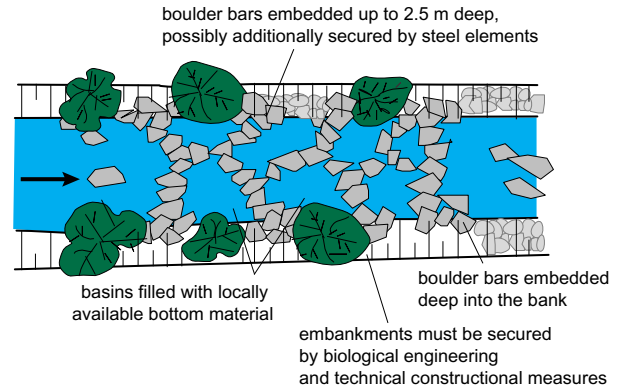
Bottom step in boulder bar construction (plan view)
